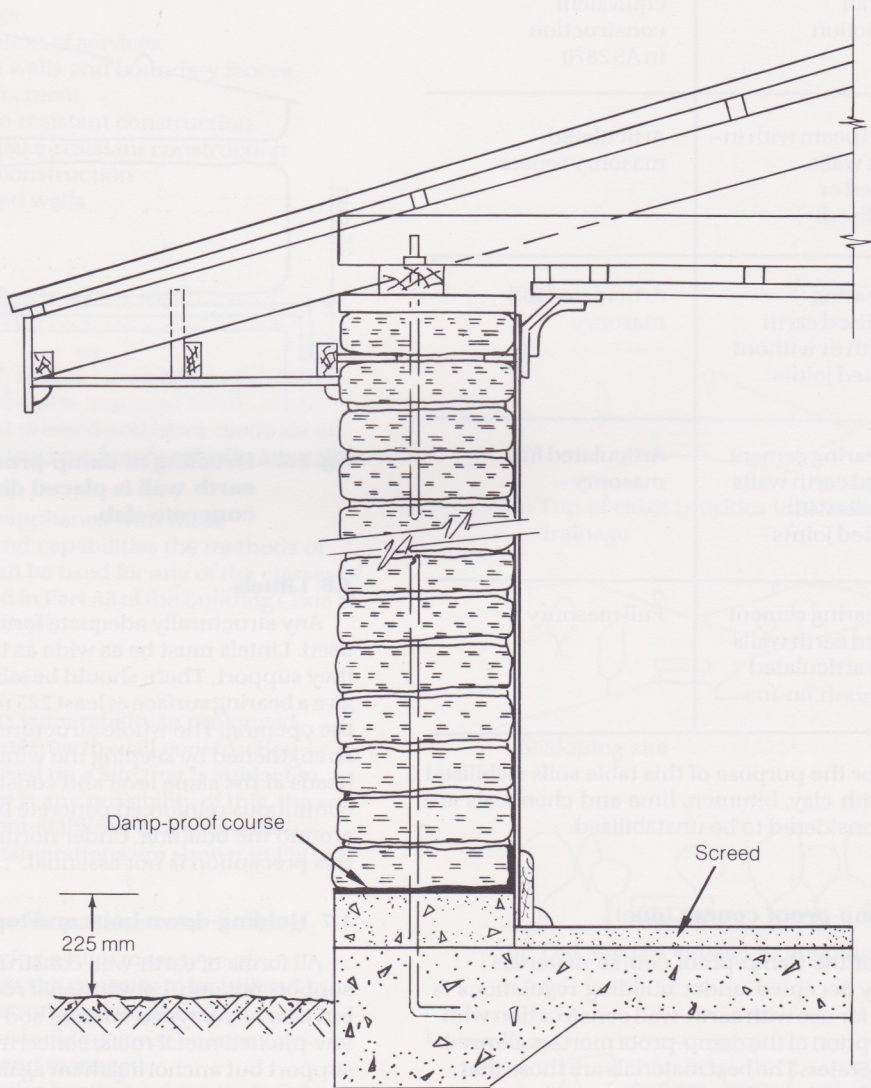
Installation of cyclone bolts in adobe walls.
